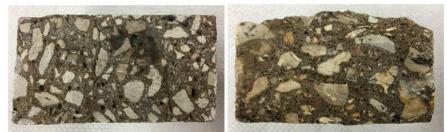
Chloride diffusion measurement of concrete samples extracted from Walker (left) and Southview (right) Bridge
